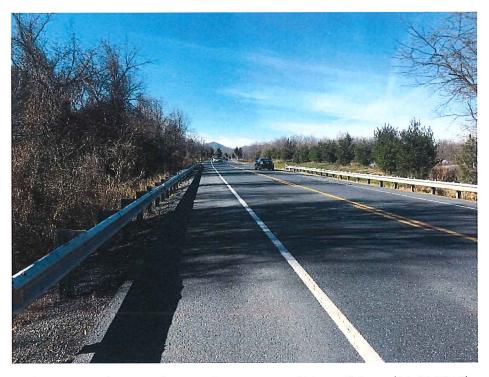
Looking Northwest Where Proposed Pipe will Cross (11-25-2016)
